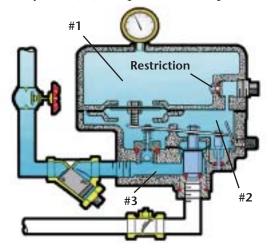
Section View of a Mechanical Accelerator in the Set Position
